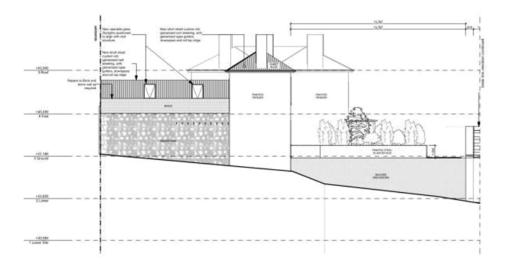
Proposed north elevation (facing into the site) showing the three-storey main dwelling on the right-hand side, and the two storey servant's wing on the left-hand side. The new black structure is the northern elevation of the proposed garden apartment.
